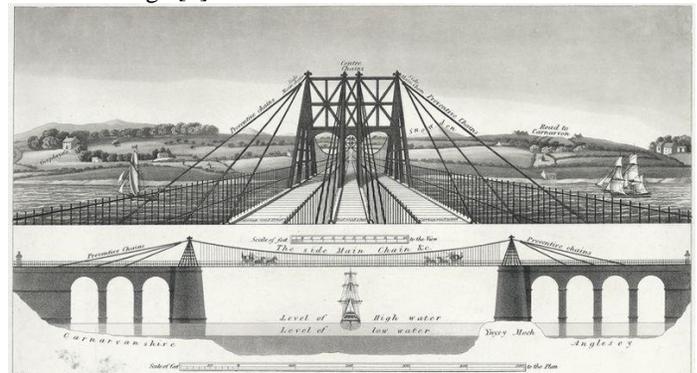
An Old Plan of Cable Bridge over the Menai Strait
